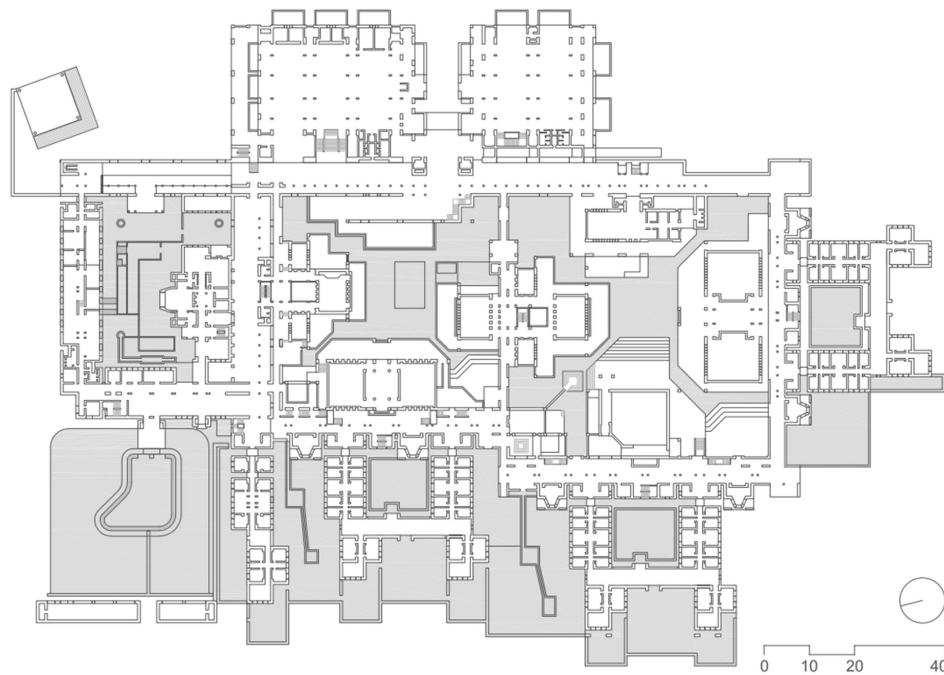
The site plan of Doshi's IIM Complex at Bangalore (main section).
